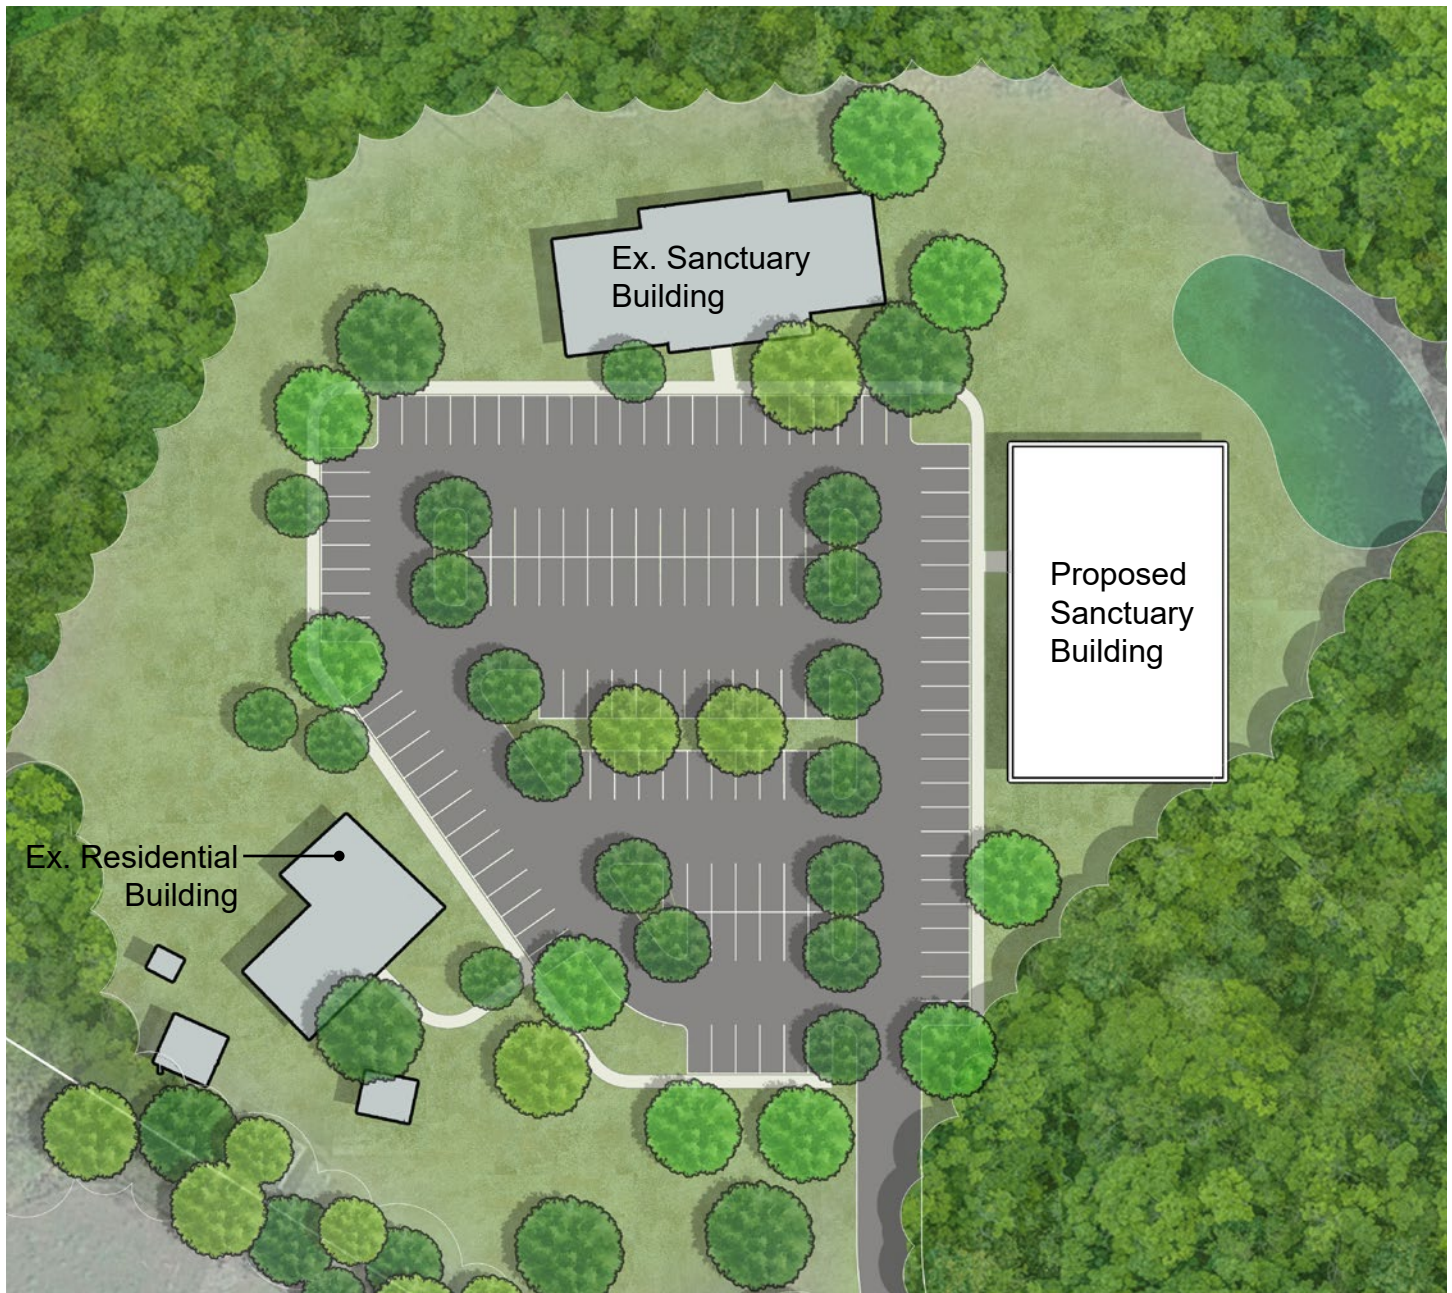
Conceptual Plan Enlargement of Central Area Showing Buildings and Parking
